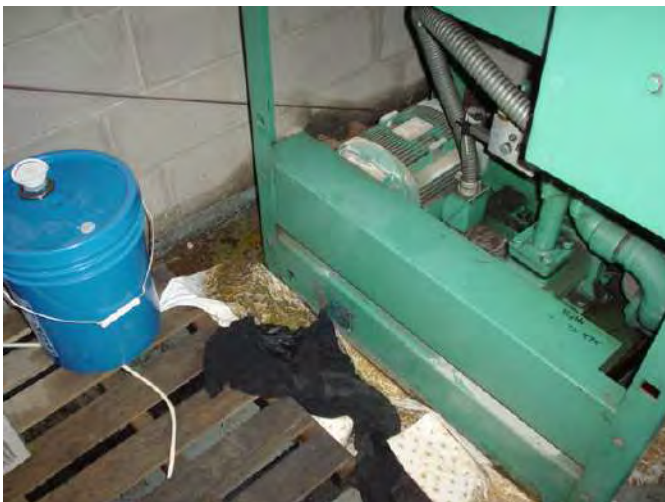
Leaking hydraulic elevator equipment to be repaired
